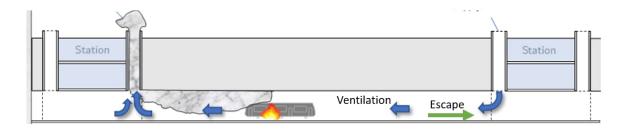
Tunnel Ventilation System that aid in escape and intervention.
